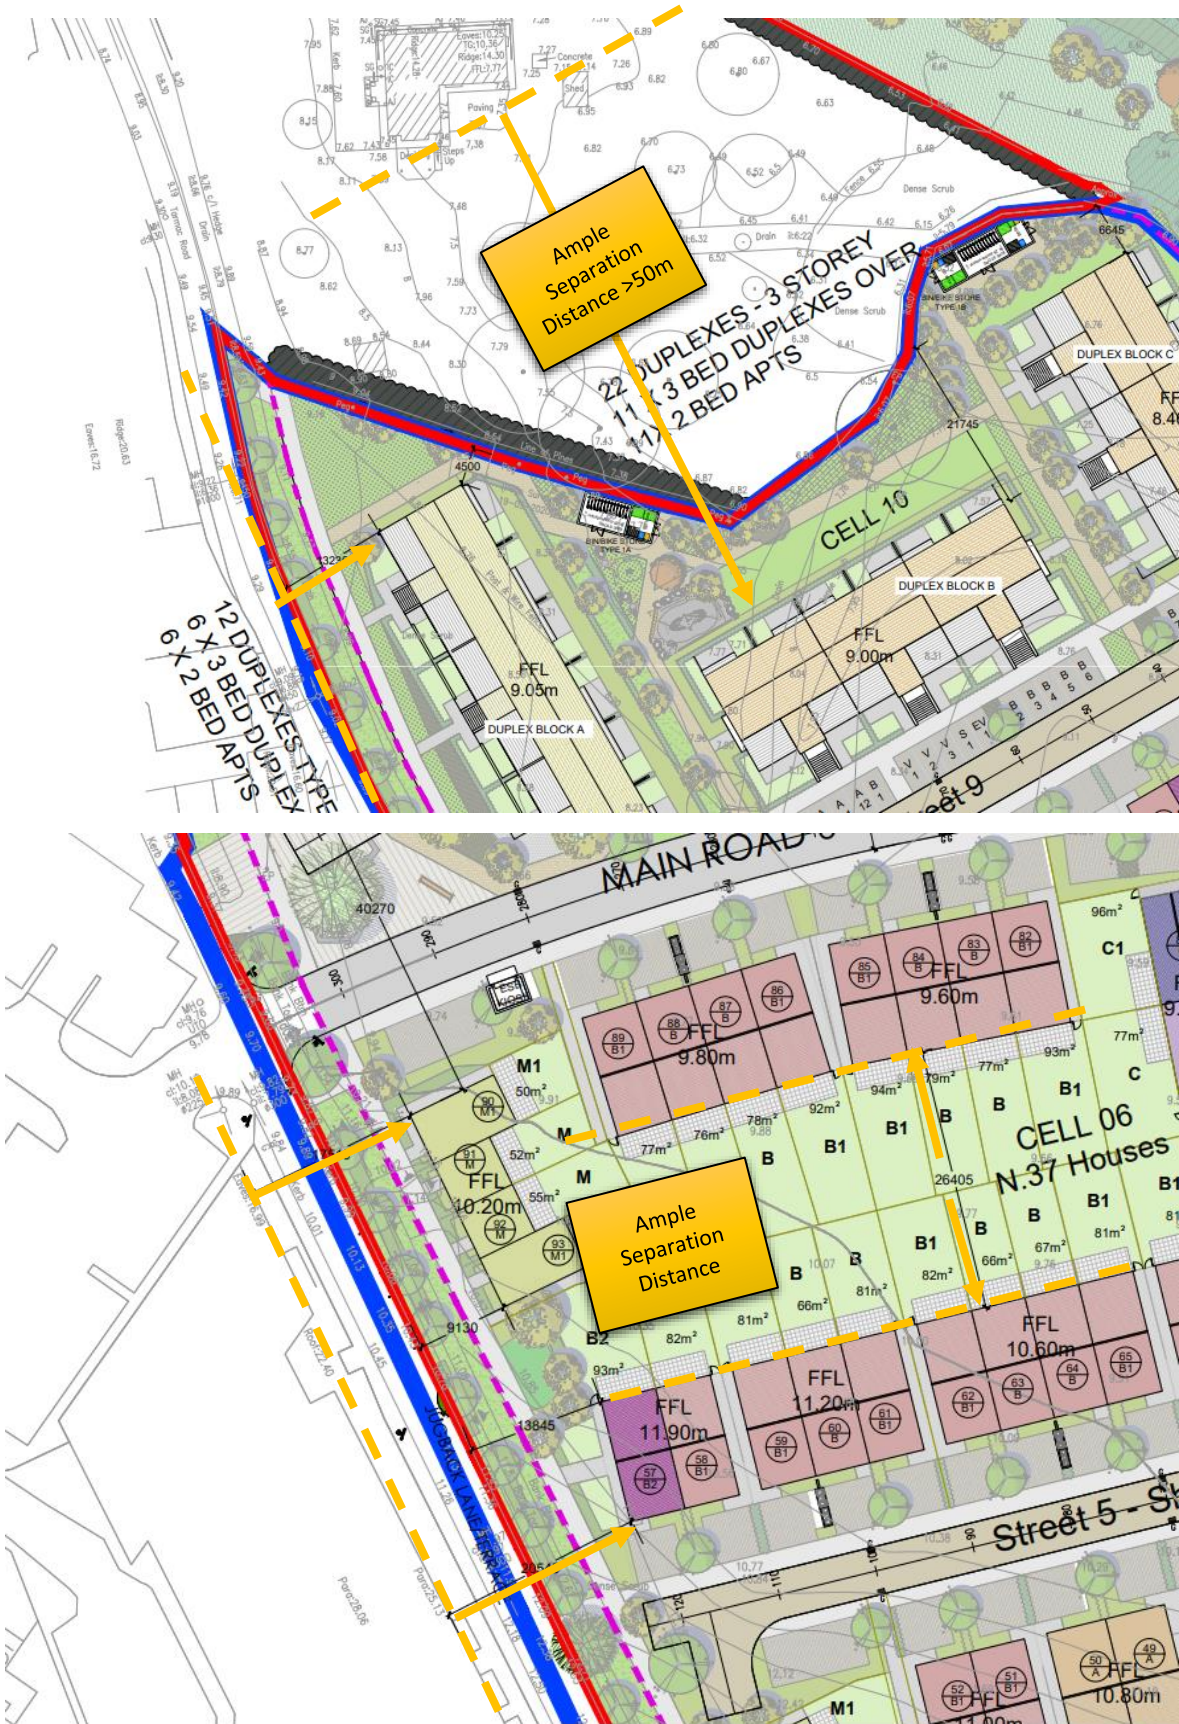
Excerpt from Site Layout Plan showing sections along Jugback road- prepared by McCrossan O'Rourke Manning Architects (Dwg N0 PLO5a Site Plan Layout Sheet 1 in 6)
